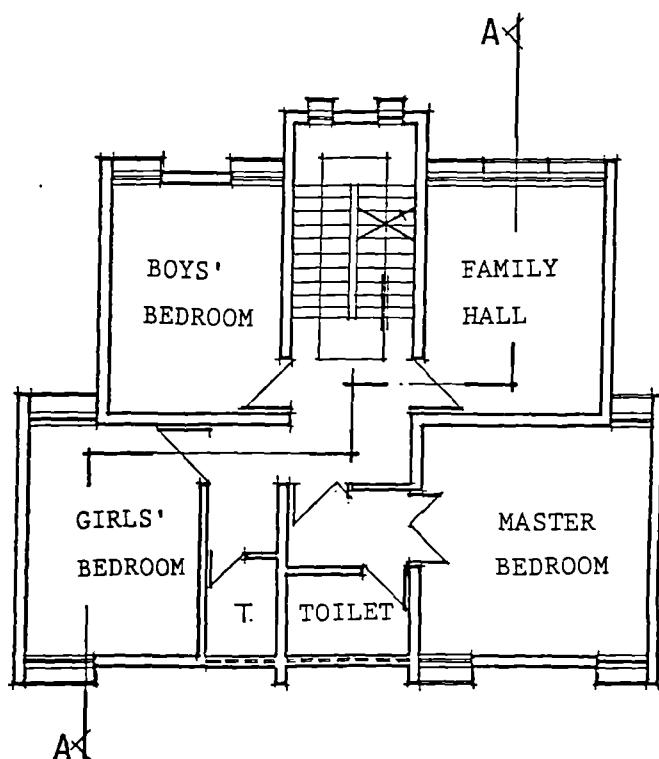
FIRST FLOOR PLAN (after modulation).
